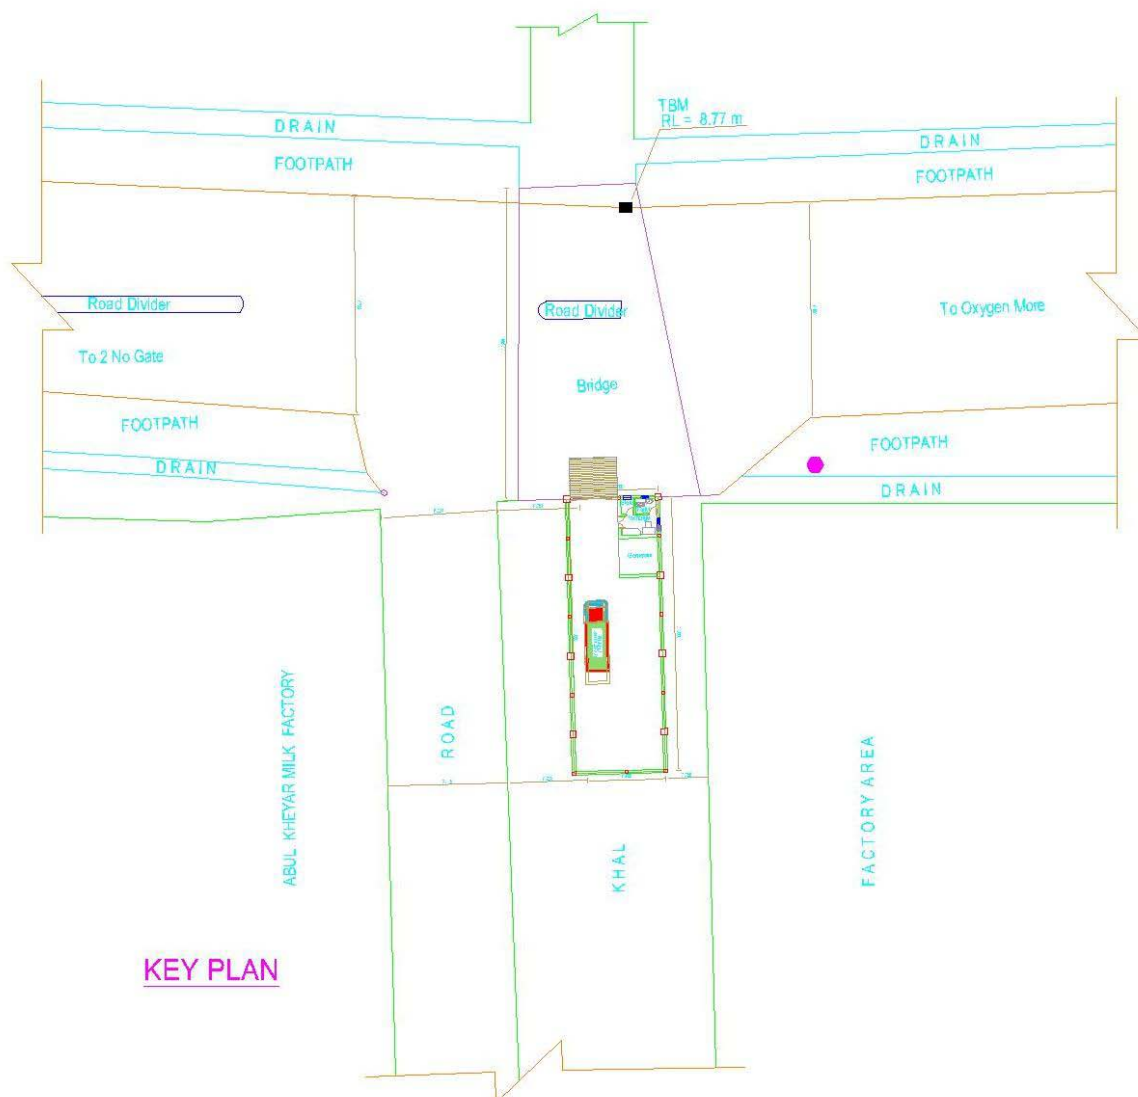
STS – 7 Bayezid Bostami Layout Plan (22°23'35"N, 91°49'4"E)
